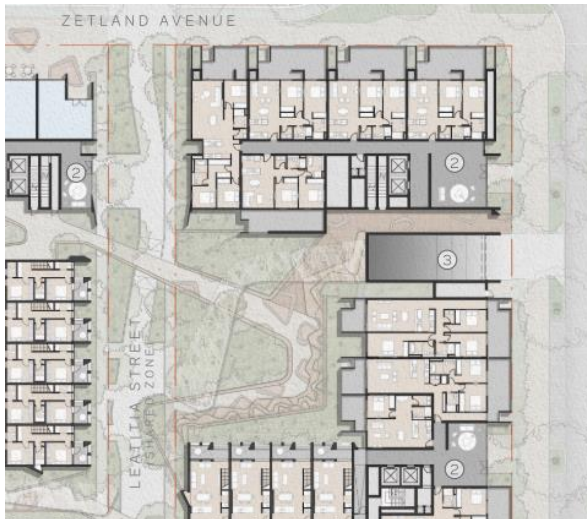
Ground floor plan showing the servicing strategy proposed in the competitive design process, with all servicing to be undertaken within the basement.
